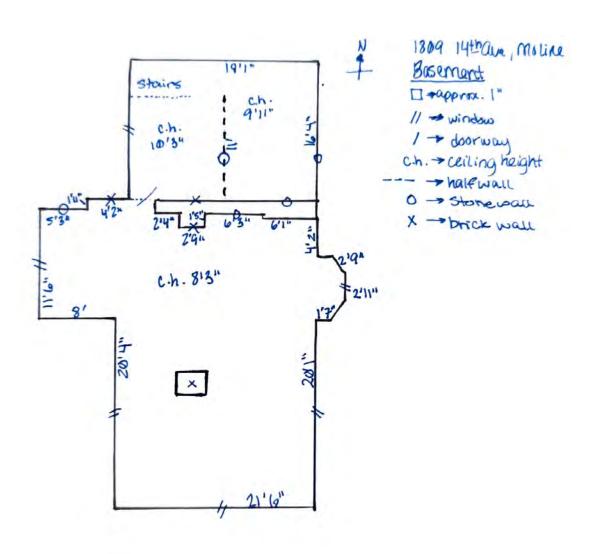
1809 14th Ave, Moline, Illinois, basement floor plan, Terracon Consultants, Inc., 2025
